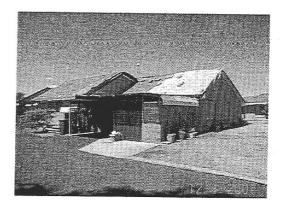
Damage to tile roof due to wind suction at leading roof edges (Cunningham St)
